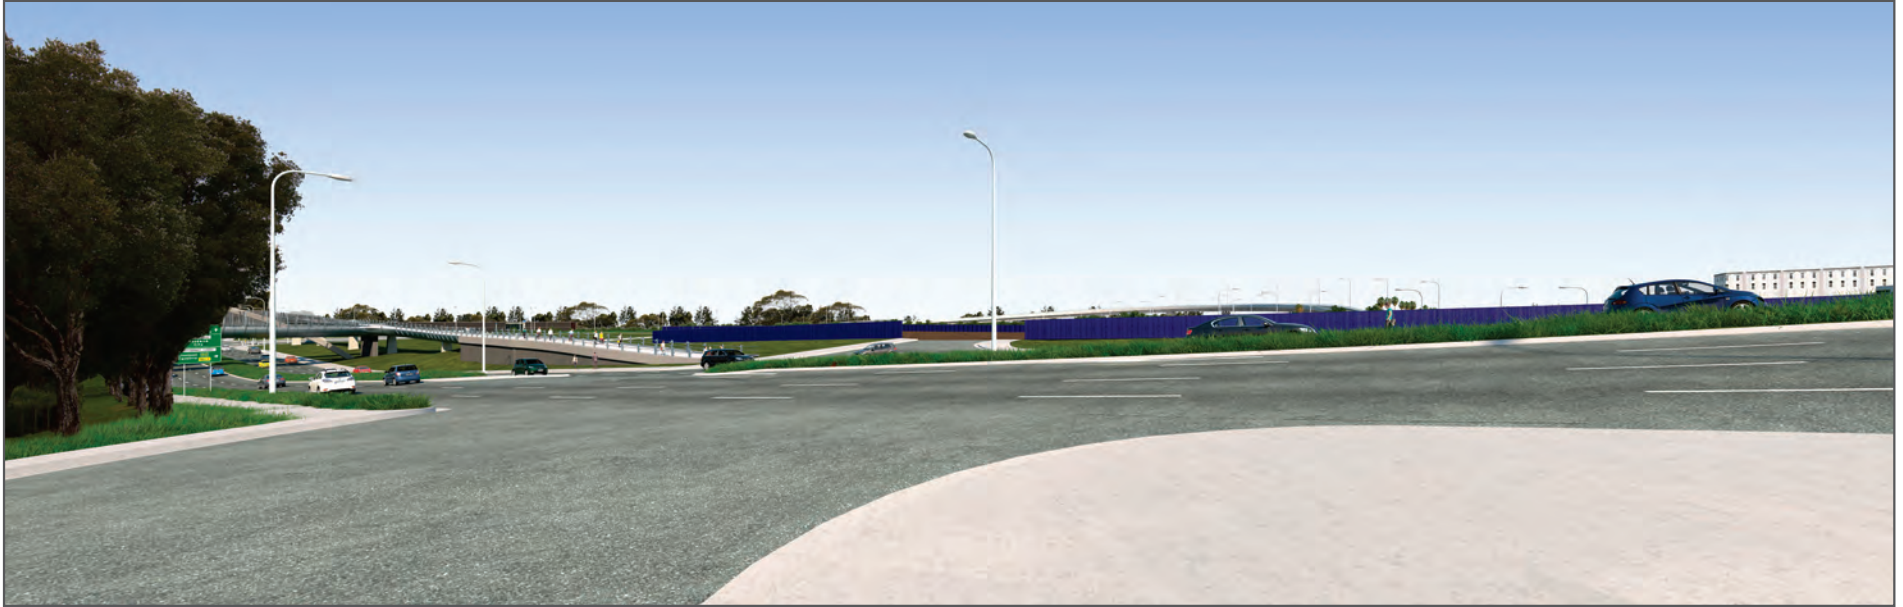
Photomontage showing the view from the corner of Barwon Park Road and Campbell Road looking west towards the St Peters interchange at opening (with M4-M5 Link construction area)
